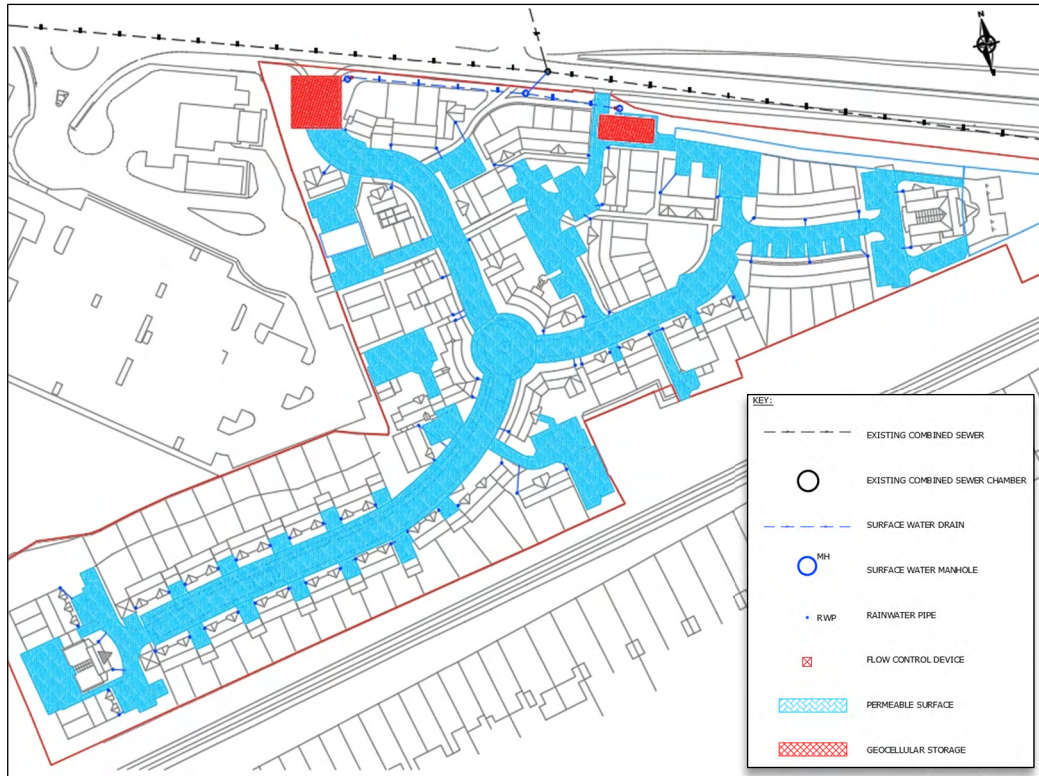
Indicative drainage layout plan showing the proposed location of SuDS.
